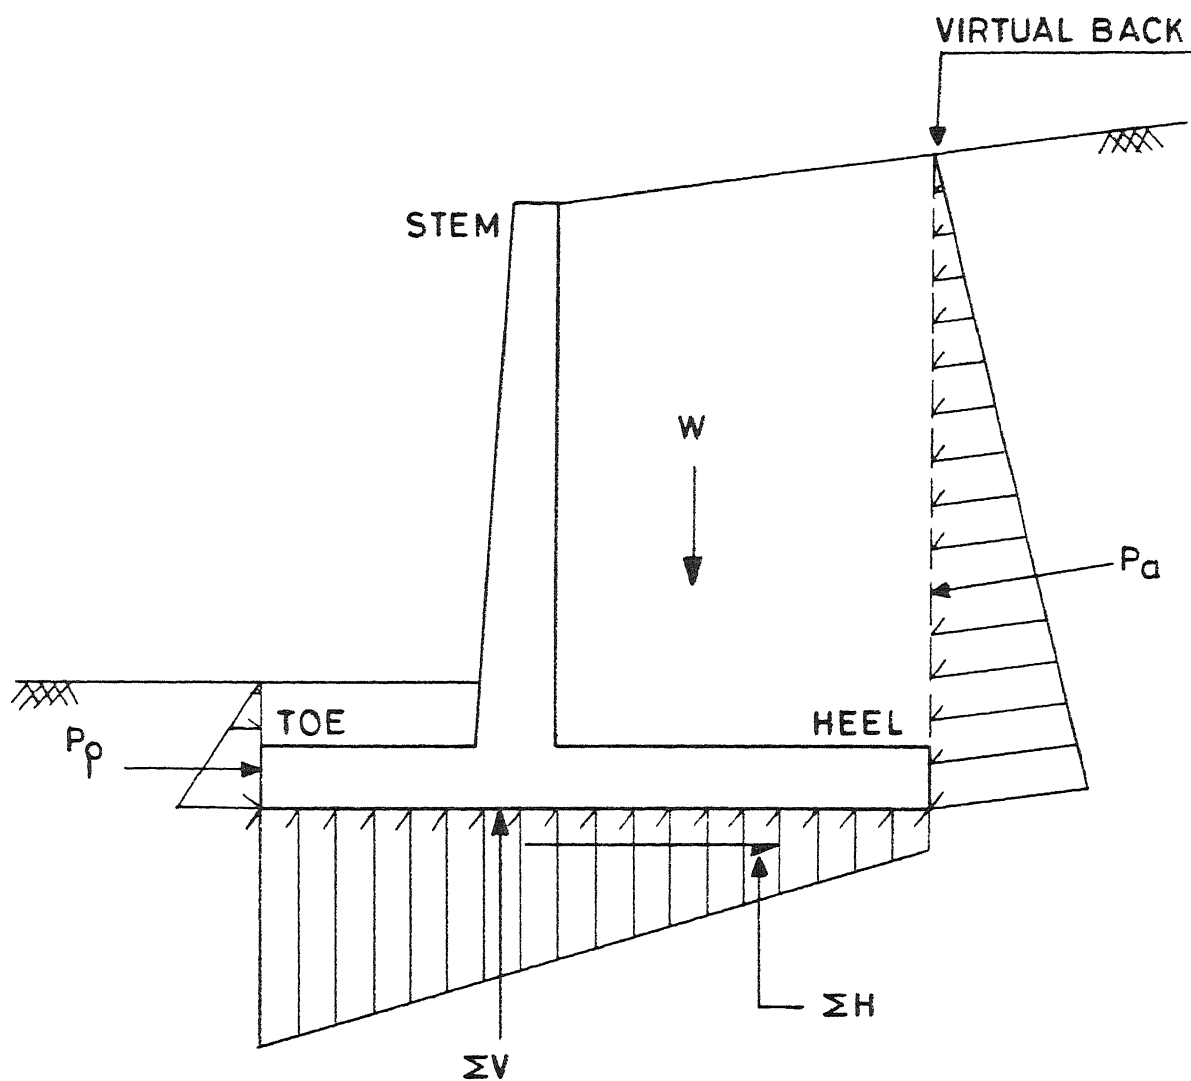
FORCES ACTING ON A RETAINING WALL .
